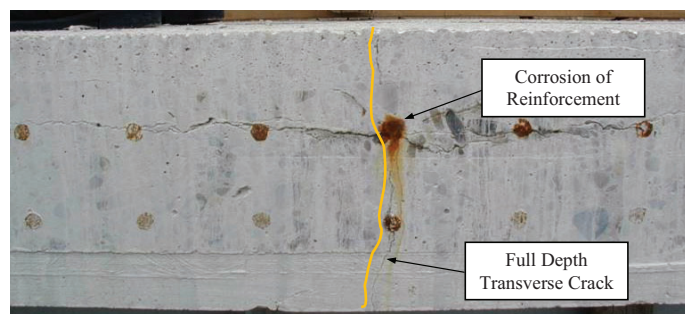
Full-depth shrinkage crack in bridge deck.
